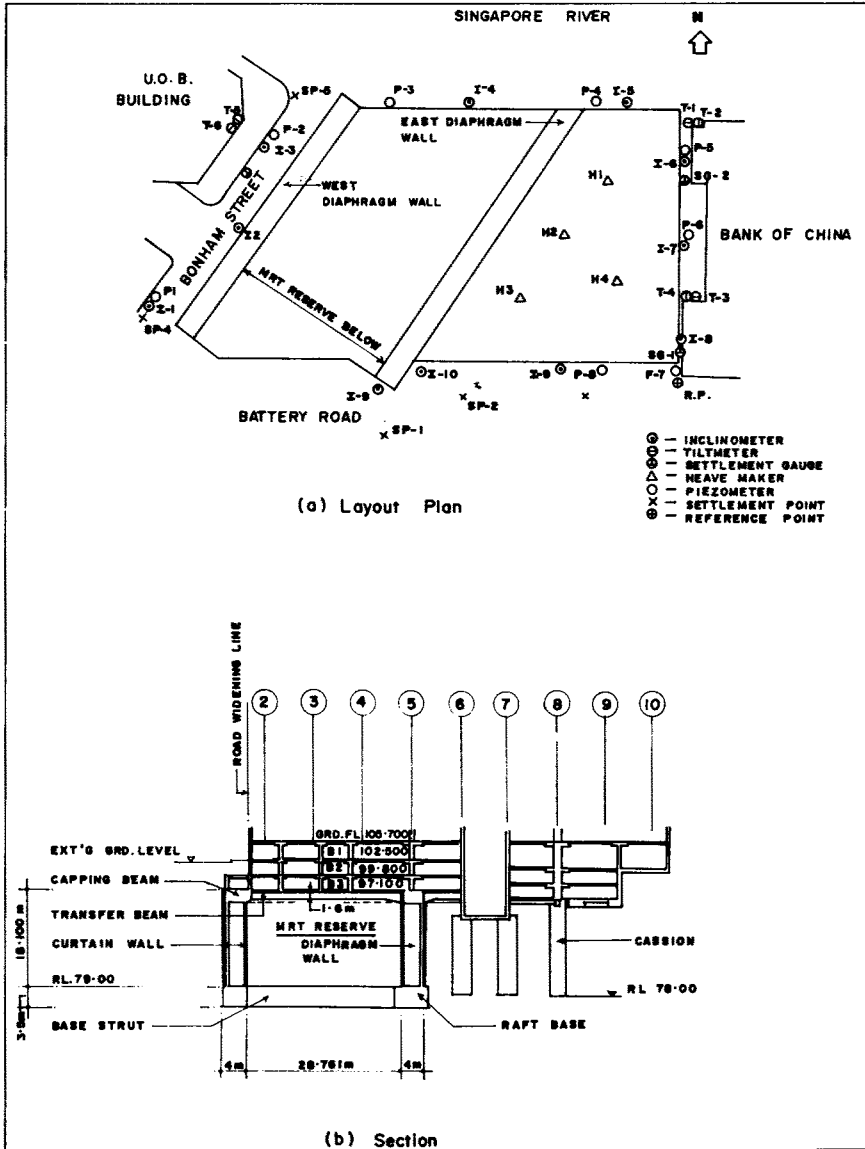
Layout Plan and Section of Chartered Bank Redevelopment, Singapore.
